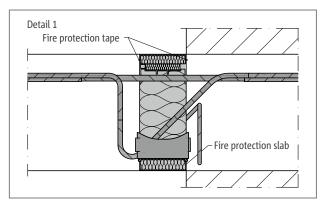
Schöck Isokorb® T type K-E, K-T for REI120: Detail 1
